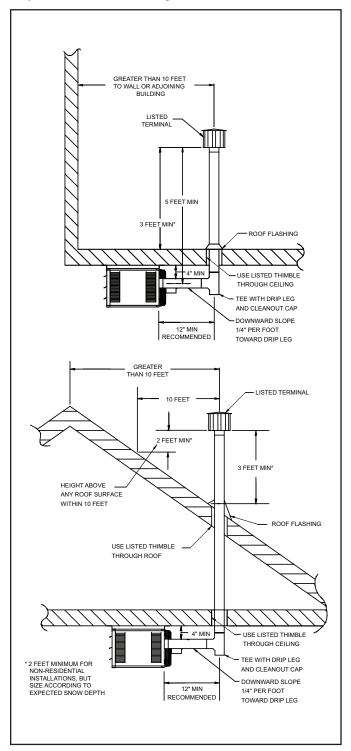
Vertical Vent Termination for Double Wall Vent Pipe and Greater Than or Less Than 8' Horizontally From a Vertical Wall or Obstruction
